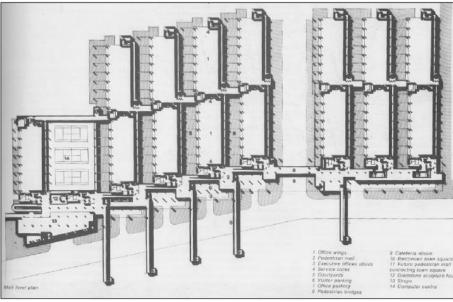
Plan of Cameron Offices, Canberra. Architect John Andrews.
